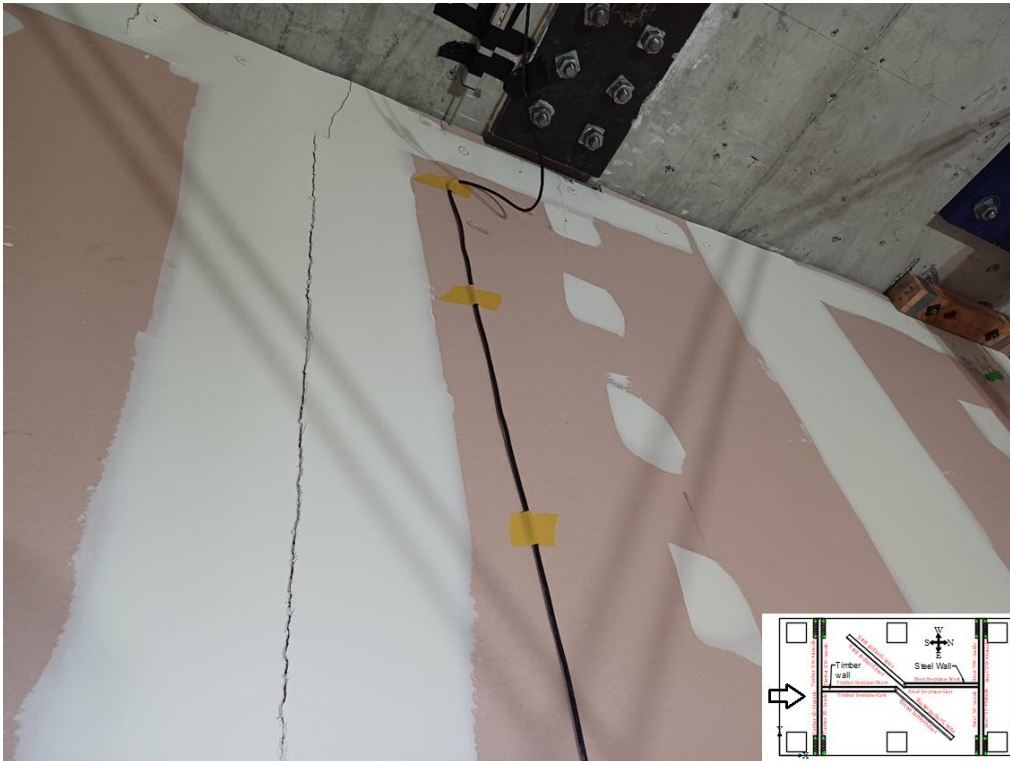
Timber South Outside wall after motion 18 - 3 % inter-storey drift
